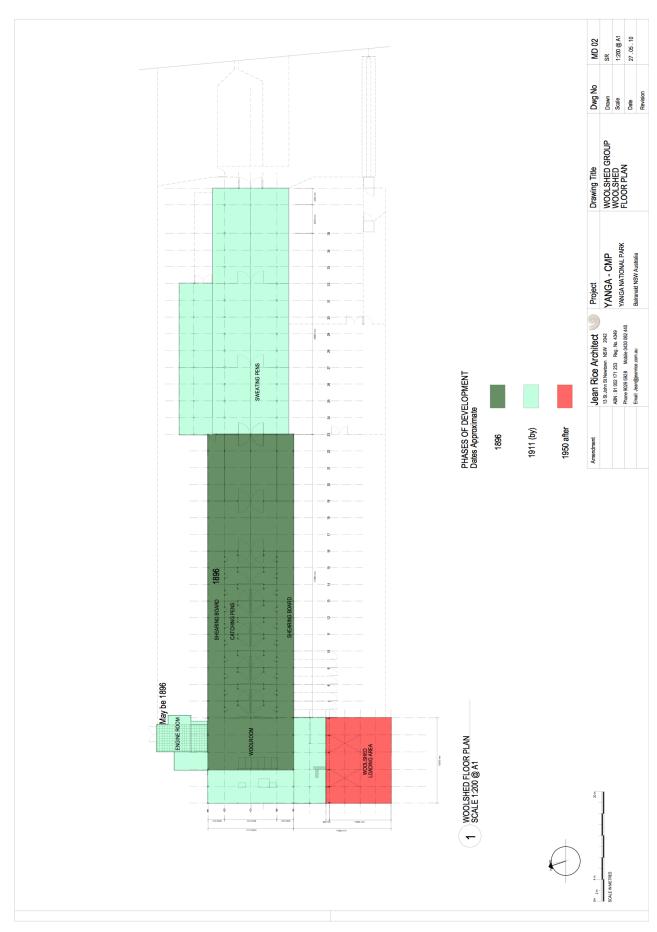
Woolshed Group Woolshed floor plan showing phases of development. Jean Rice Architect, 2009.
